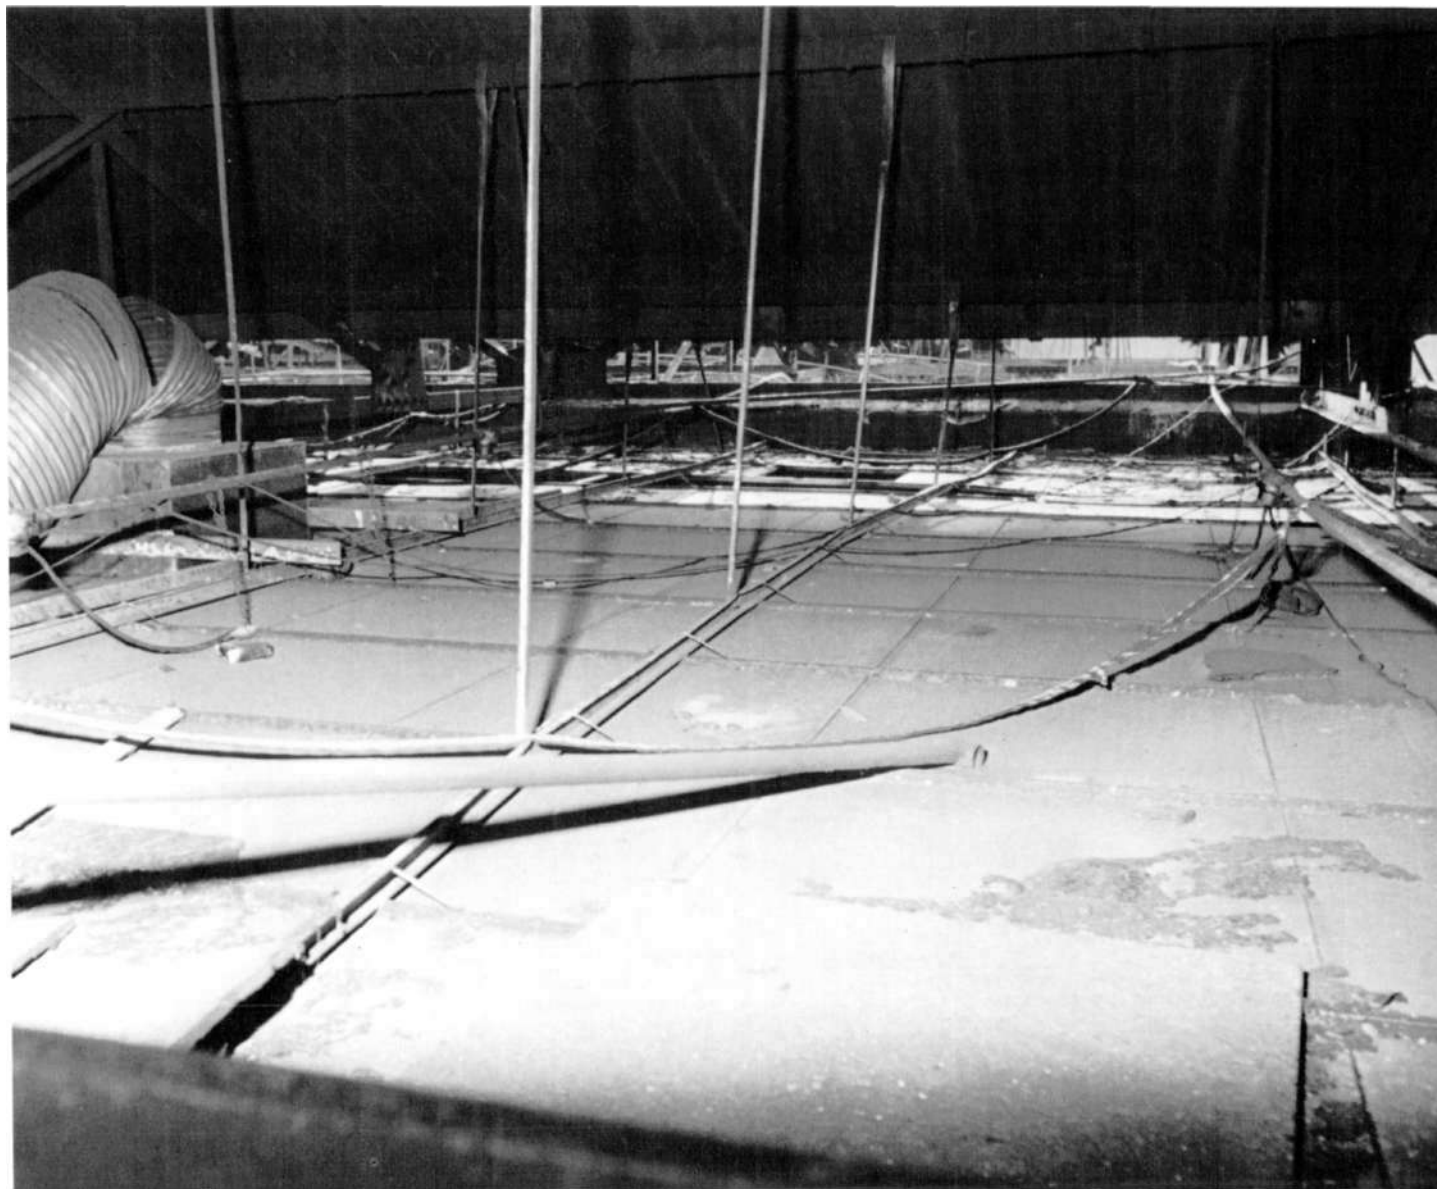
Photograph taken in roof space facing towards the Stardust. The vertical suspended ceiling are clearly visible while to the left a damaged air-circulation
